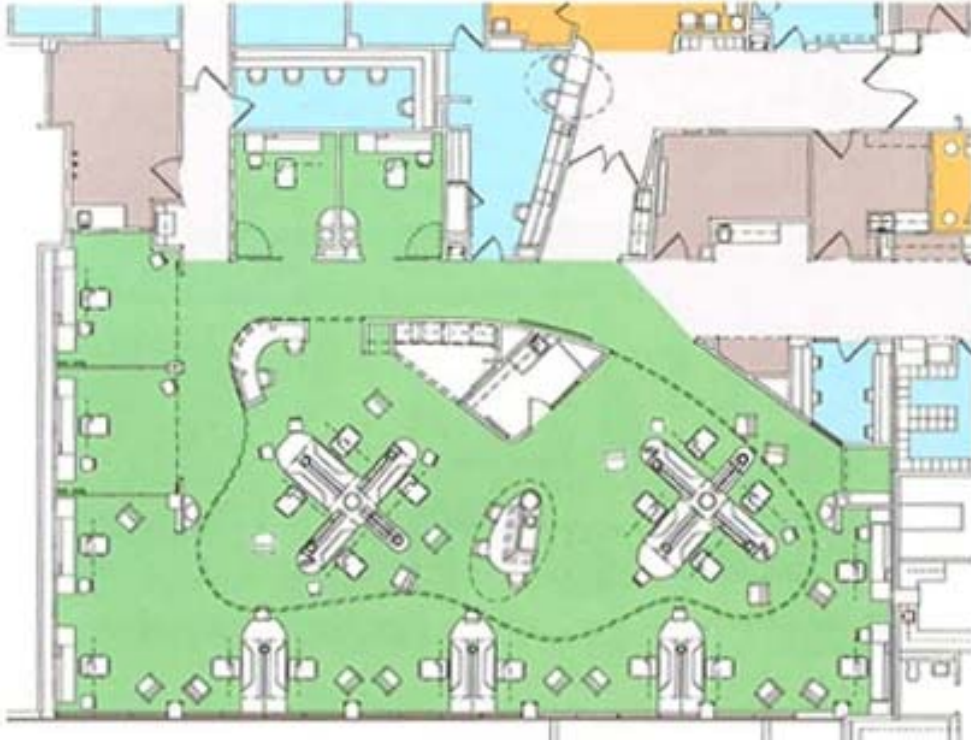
Open-Bay design floor plan (Source: Shepley, 2014, p. 100)
